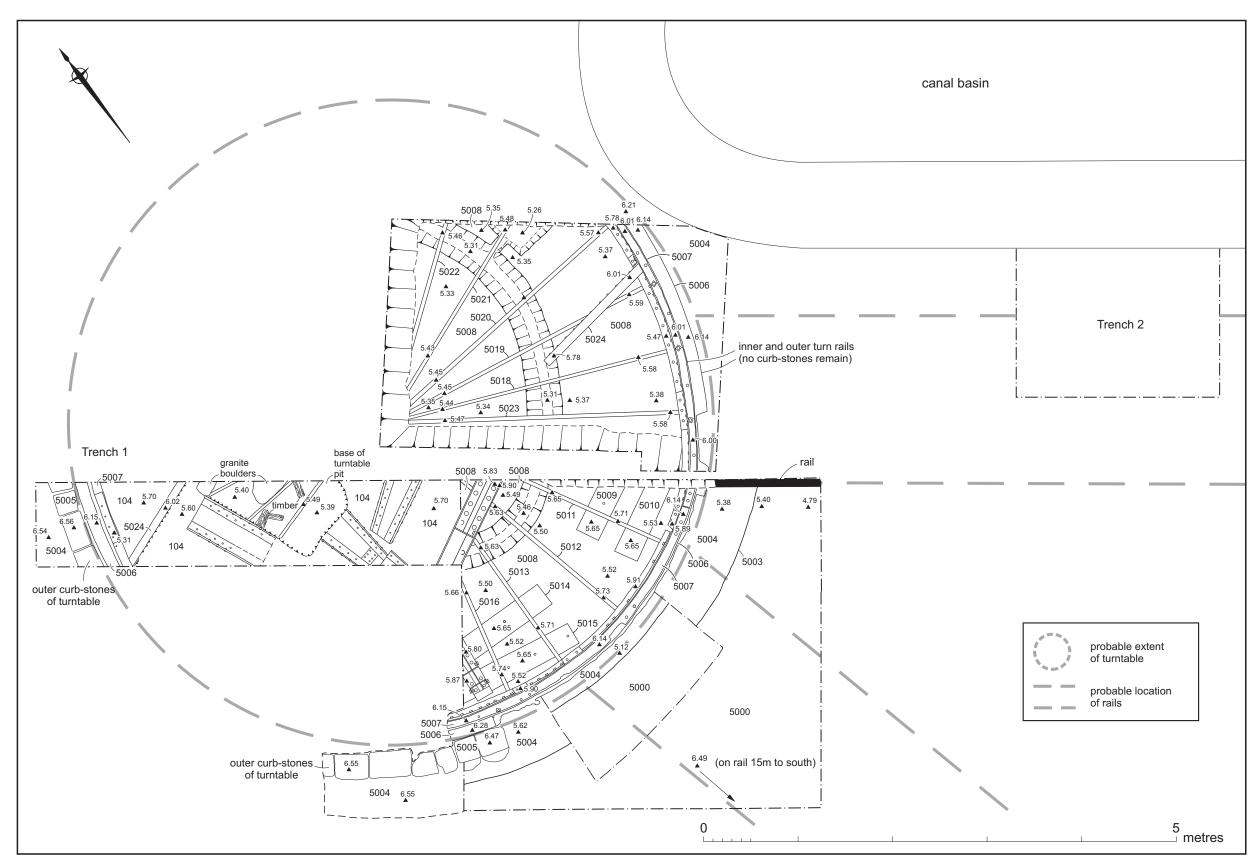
Detailed plan of turntable Trench 1. Scale 1:40.
